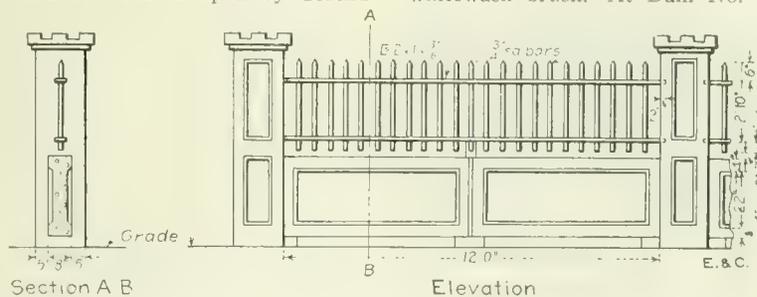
Detail of Typical Post and Panel of Concrete and Metal Fence Around Georgetown Reservoir, Washington, D. C.
